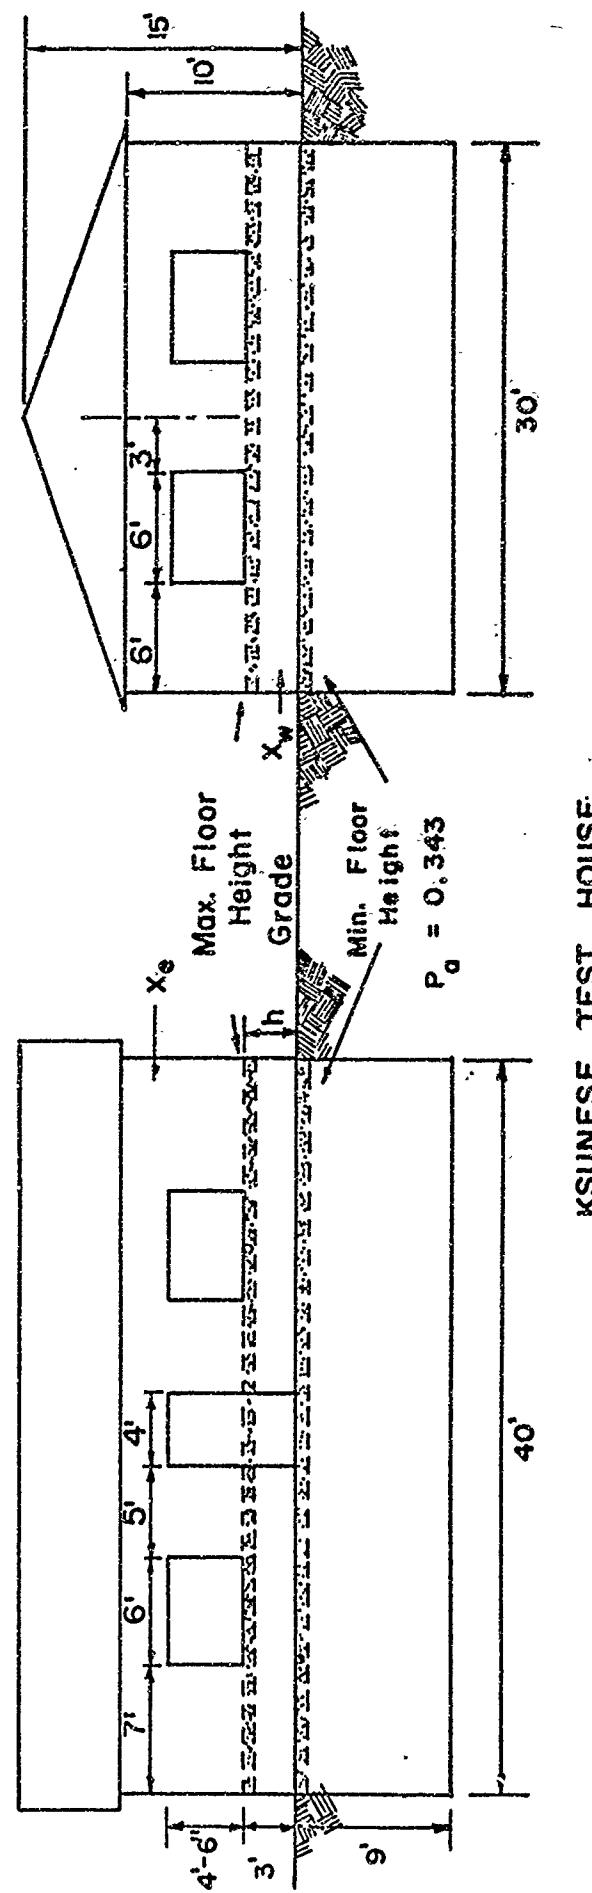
Front and side views of the test structure showing nominal dimensions.
